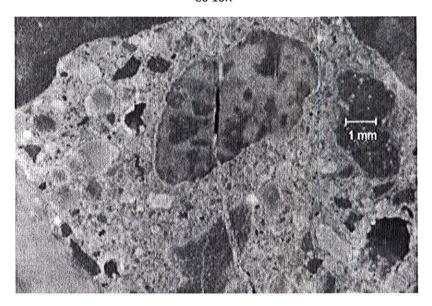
Photo 12 Appendix C page 148 Expansion crack through the aggregate in core C6
